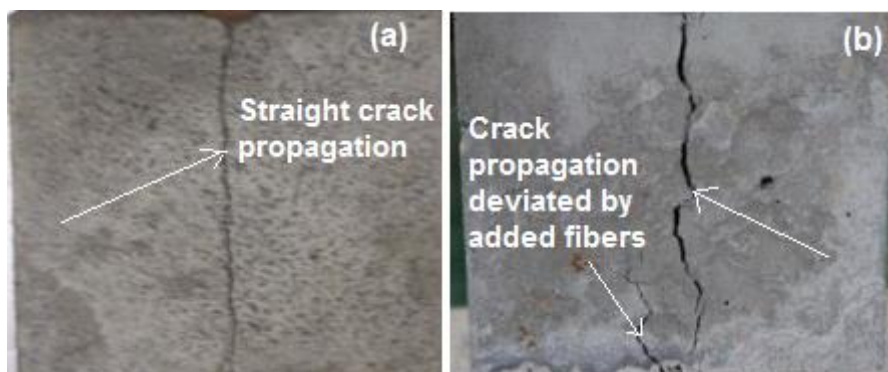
Crack propagation in conventional and fibre reinforced concrete samples
